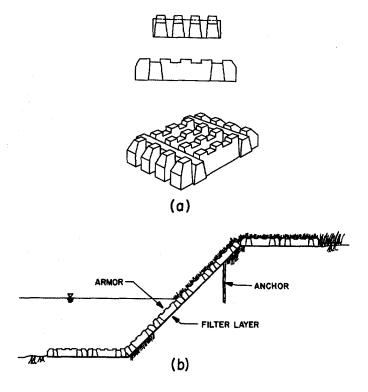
Monoslab revetment (a) block detail and (b) revetment detail.
